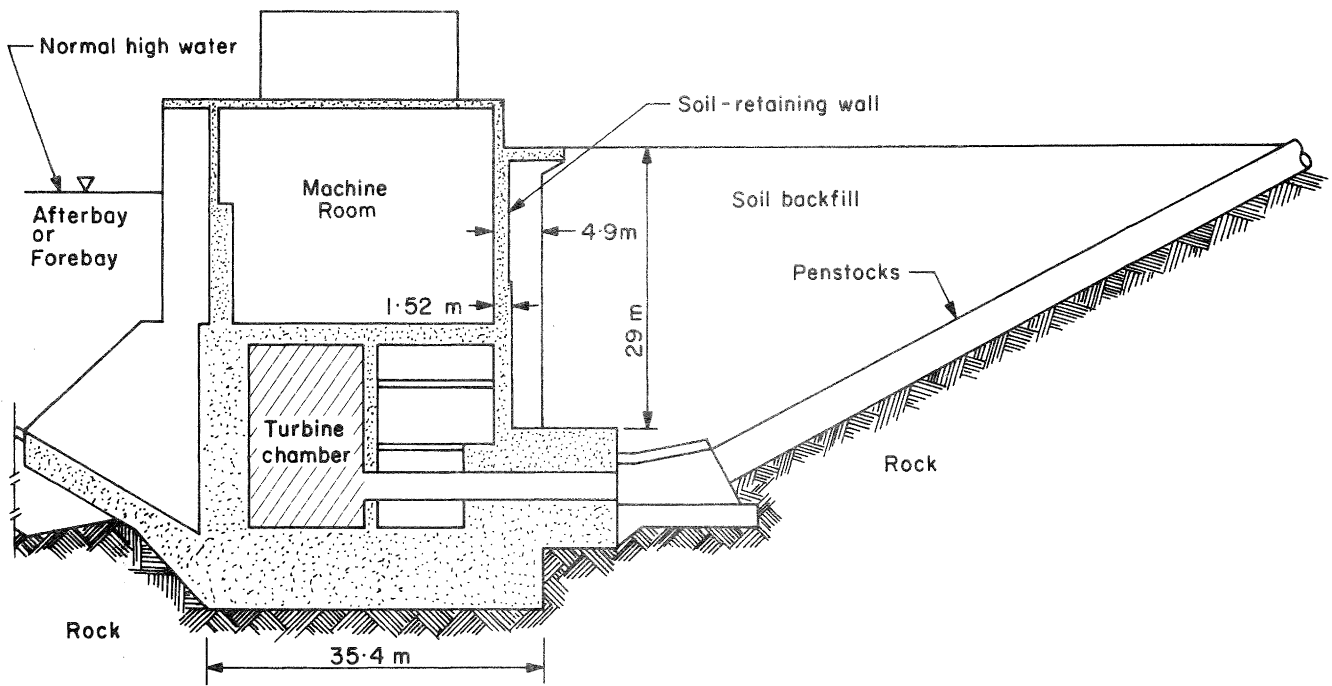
CASTAIC POWER STATION. TYPICAL CROSS-SECTION.
